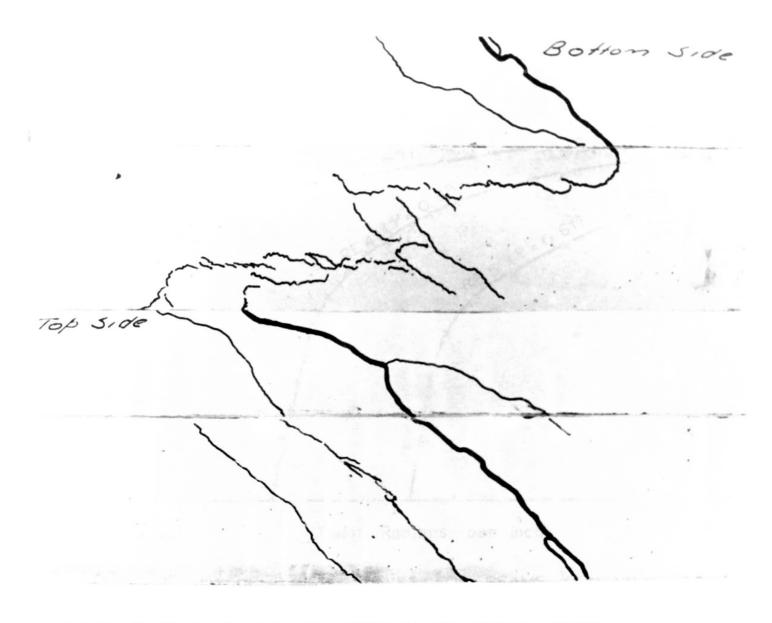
DEVELOPED FAILURE SURFACE OF BEAM 38T5
